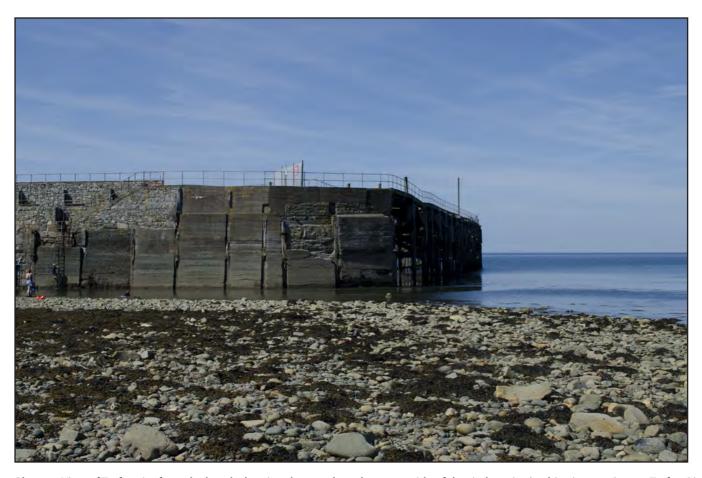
View of Trefor pier from the beach showing damaged northwestern side of the timber pier (archive image: G2475_Trefor_Pier_016)
